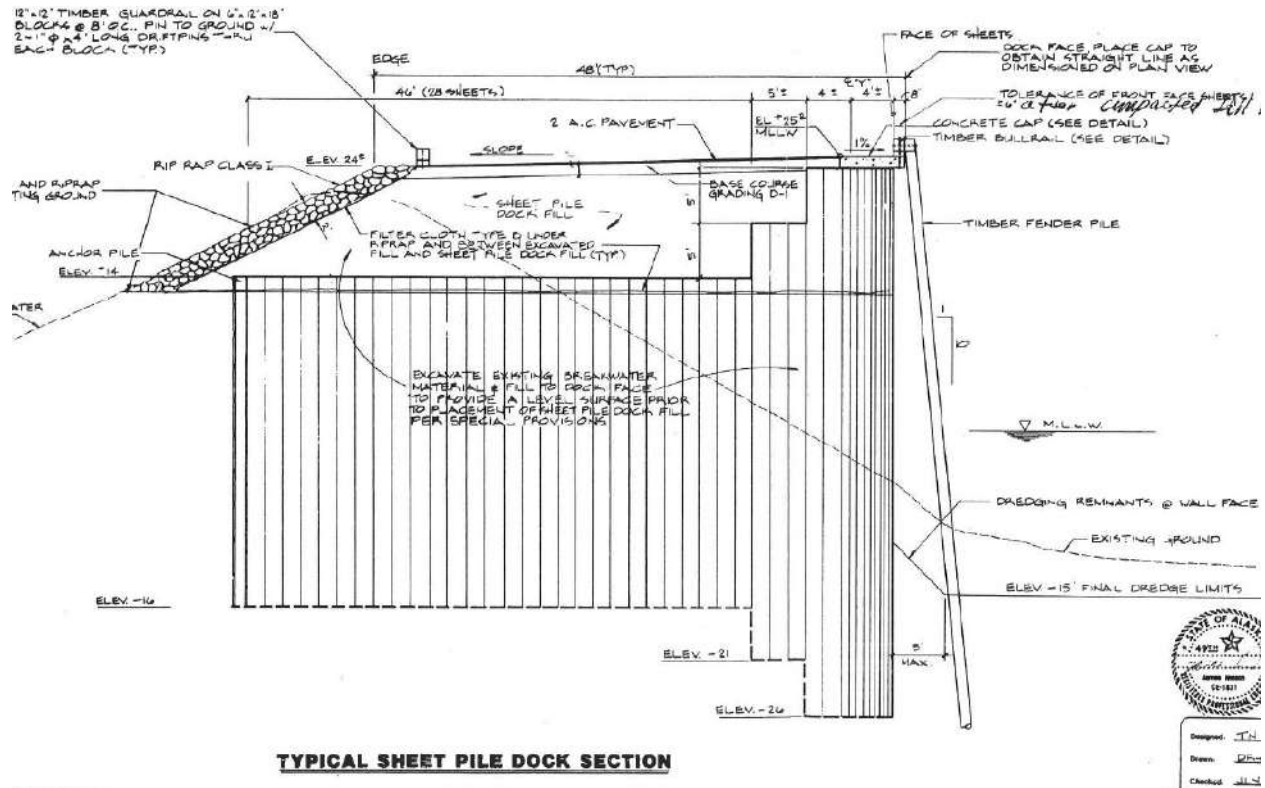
Excerpt from 1988 Fishermen’s Terminal upgrade showing jetty expansion project depth of steel sheet piling and repose of slope on backside.
